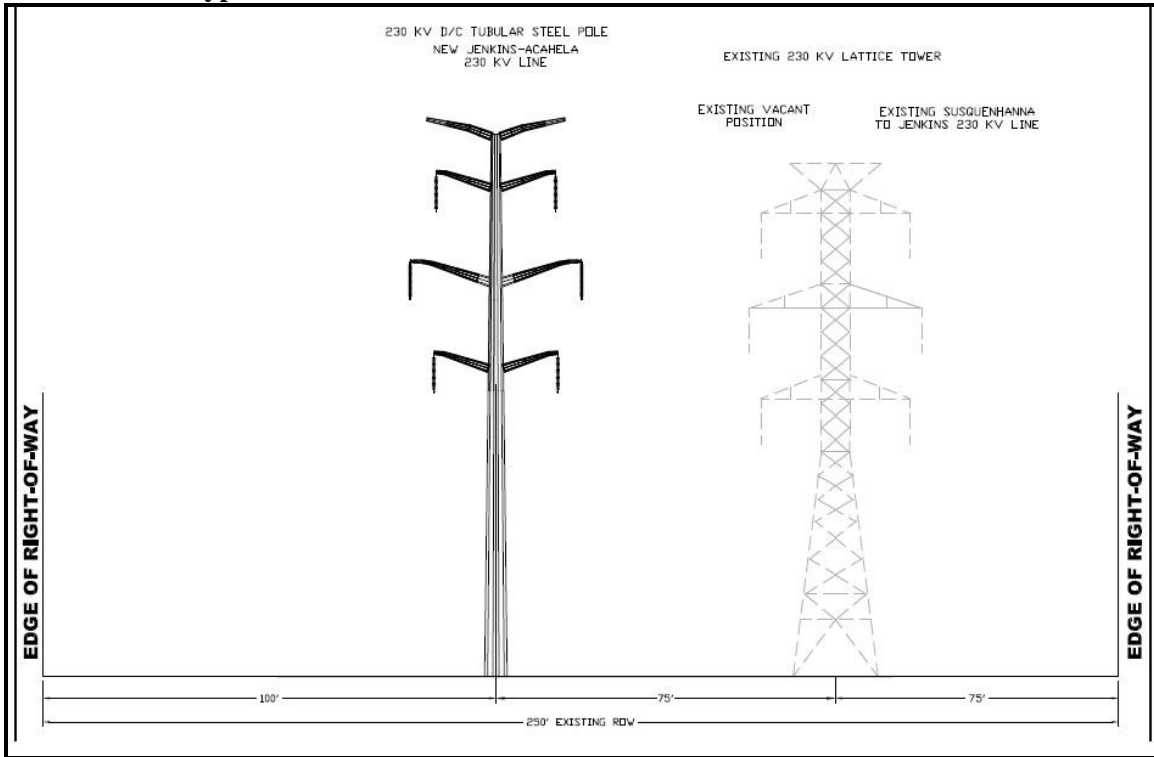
Typical 230 kV ROW Cross-Section: Jenkins to Paupack Substation
